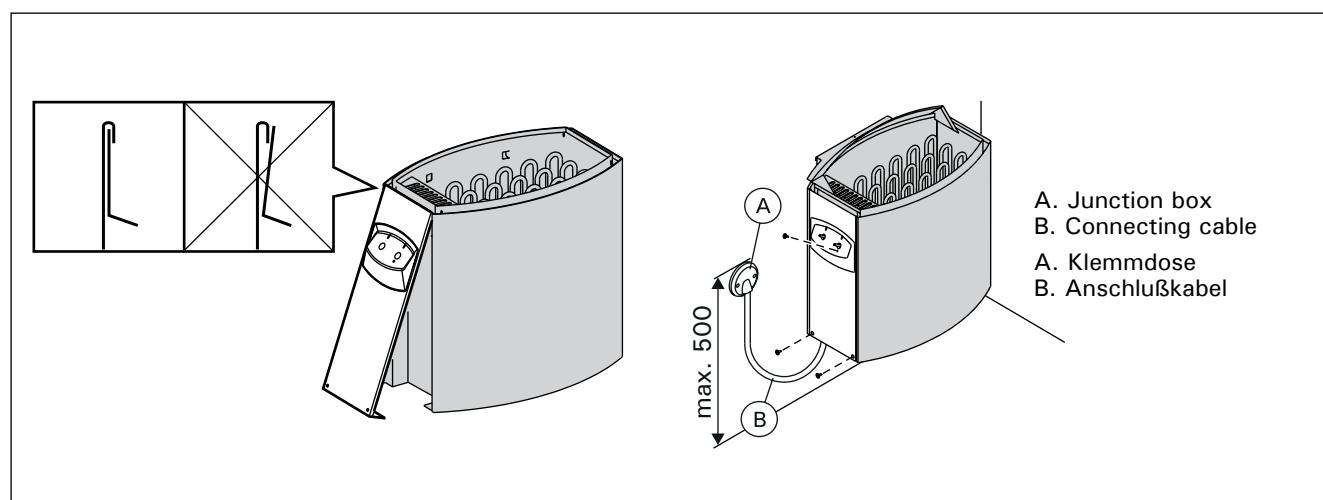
Closing the cover of the connection box (all dimensions in millimeters)
